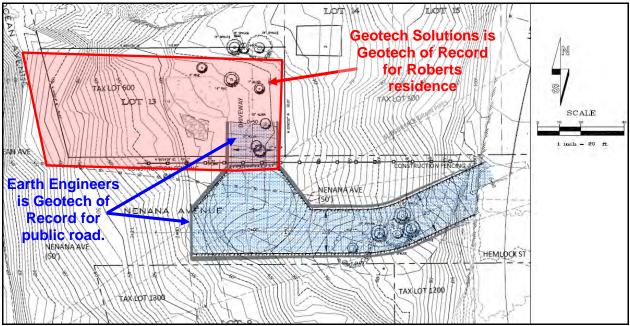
Site plan (base drawing source: Sheet 1 of Morgan Civil Engineering's 5/19/20 drawing set).
